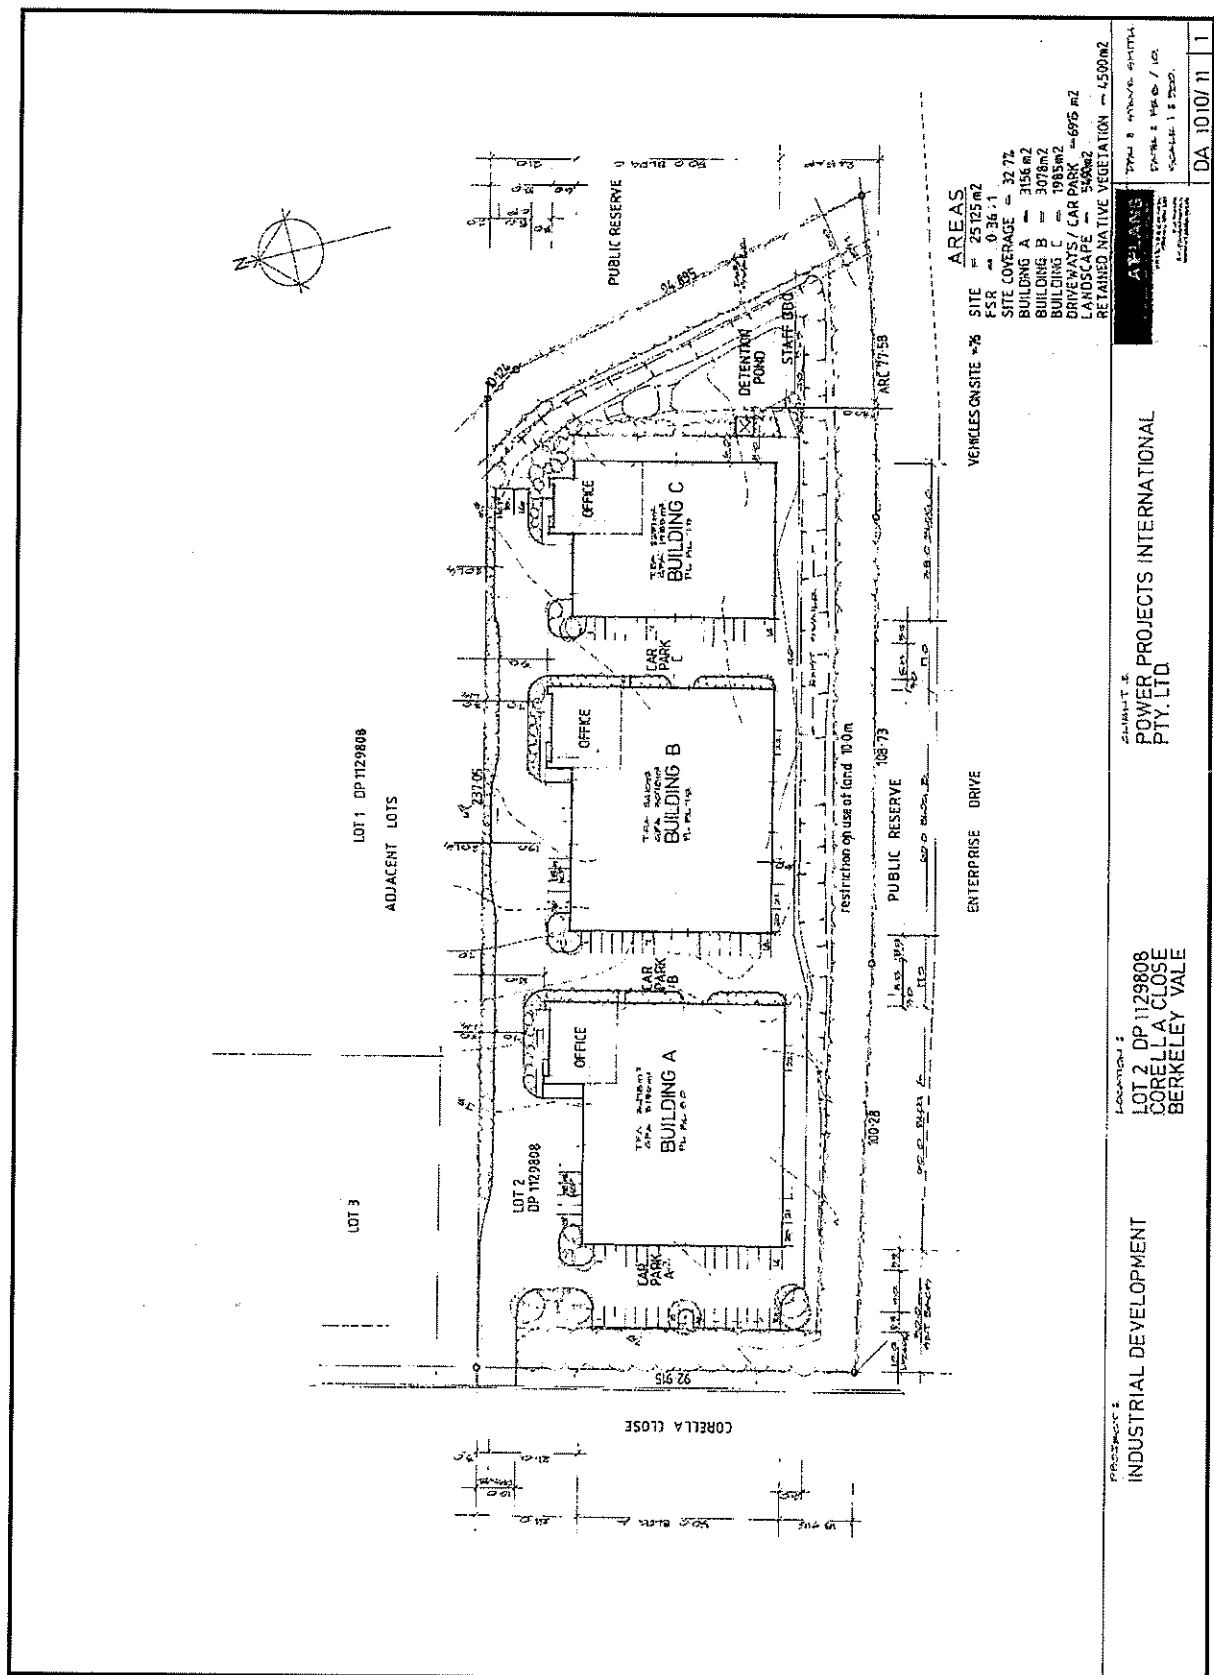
Original site plan (since amended to provide continuous perimeter access road as shown in Attachment 1.)
